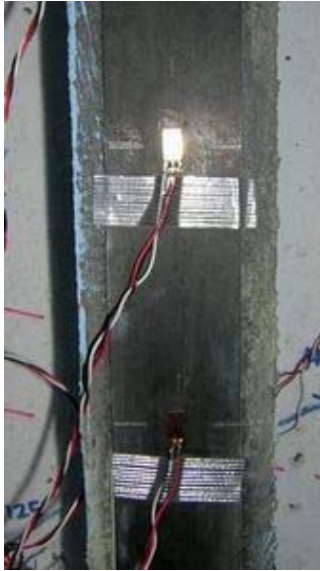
Layout of the Instrumentation for T-Beam 3S
